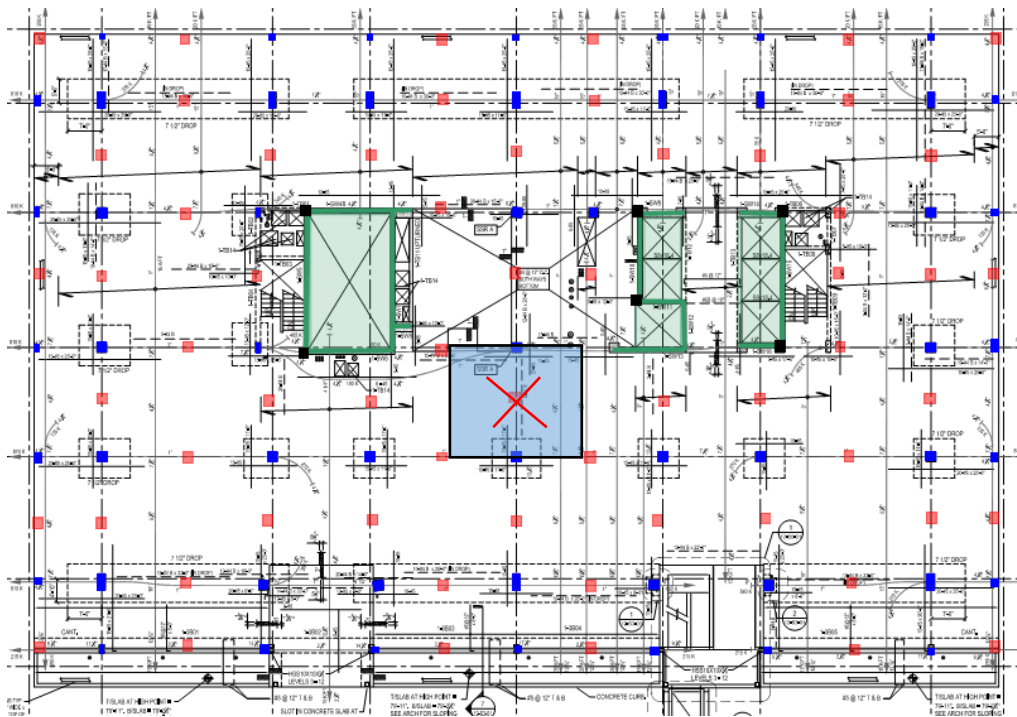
Plan view of the additional, intermediate columns added for system 1. These additional columns are shown in red.
